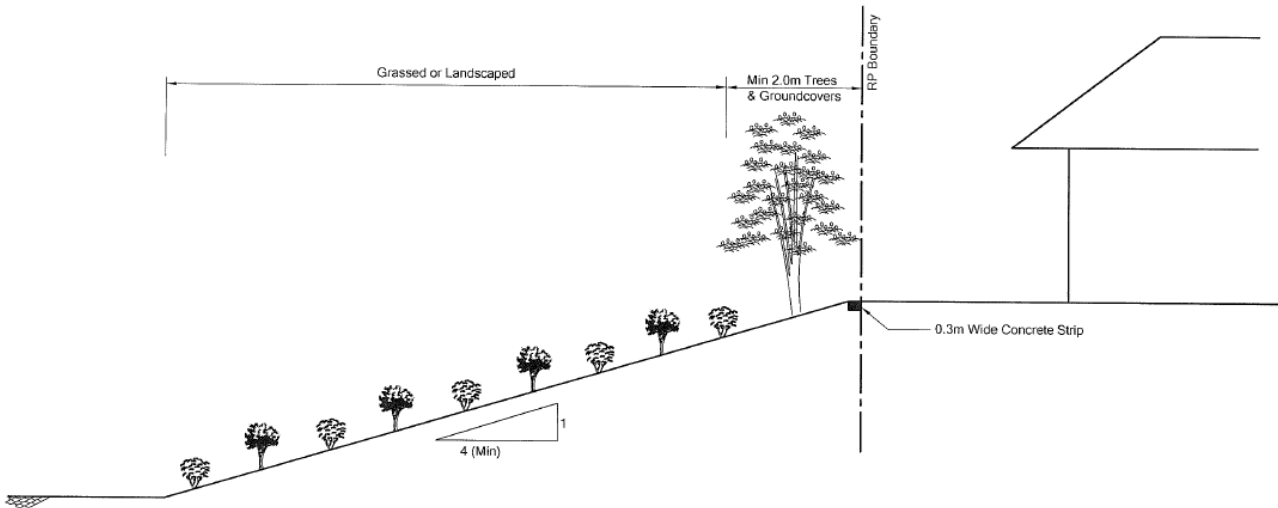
Fill embankment: landscaped batter adjacent to a concrete strip
